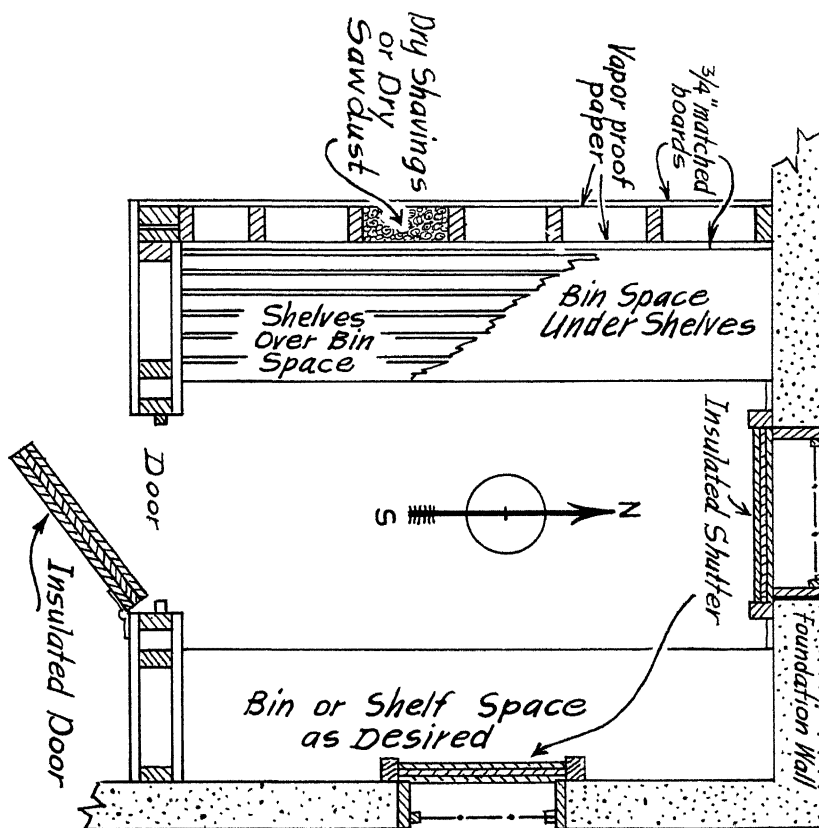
Suggested floor plan for a storage room in corner of the cellar. The insulated shutters (made of three pieces of vapor-proof insulation board) are adjustable for regulating cold air intake.
